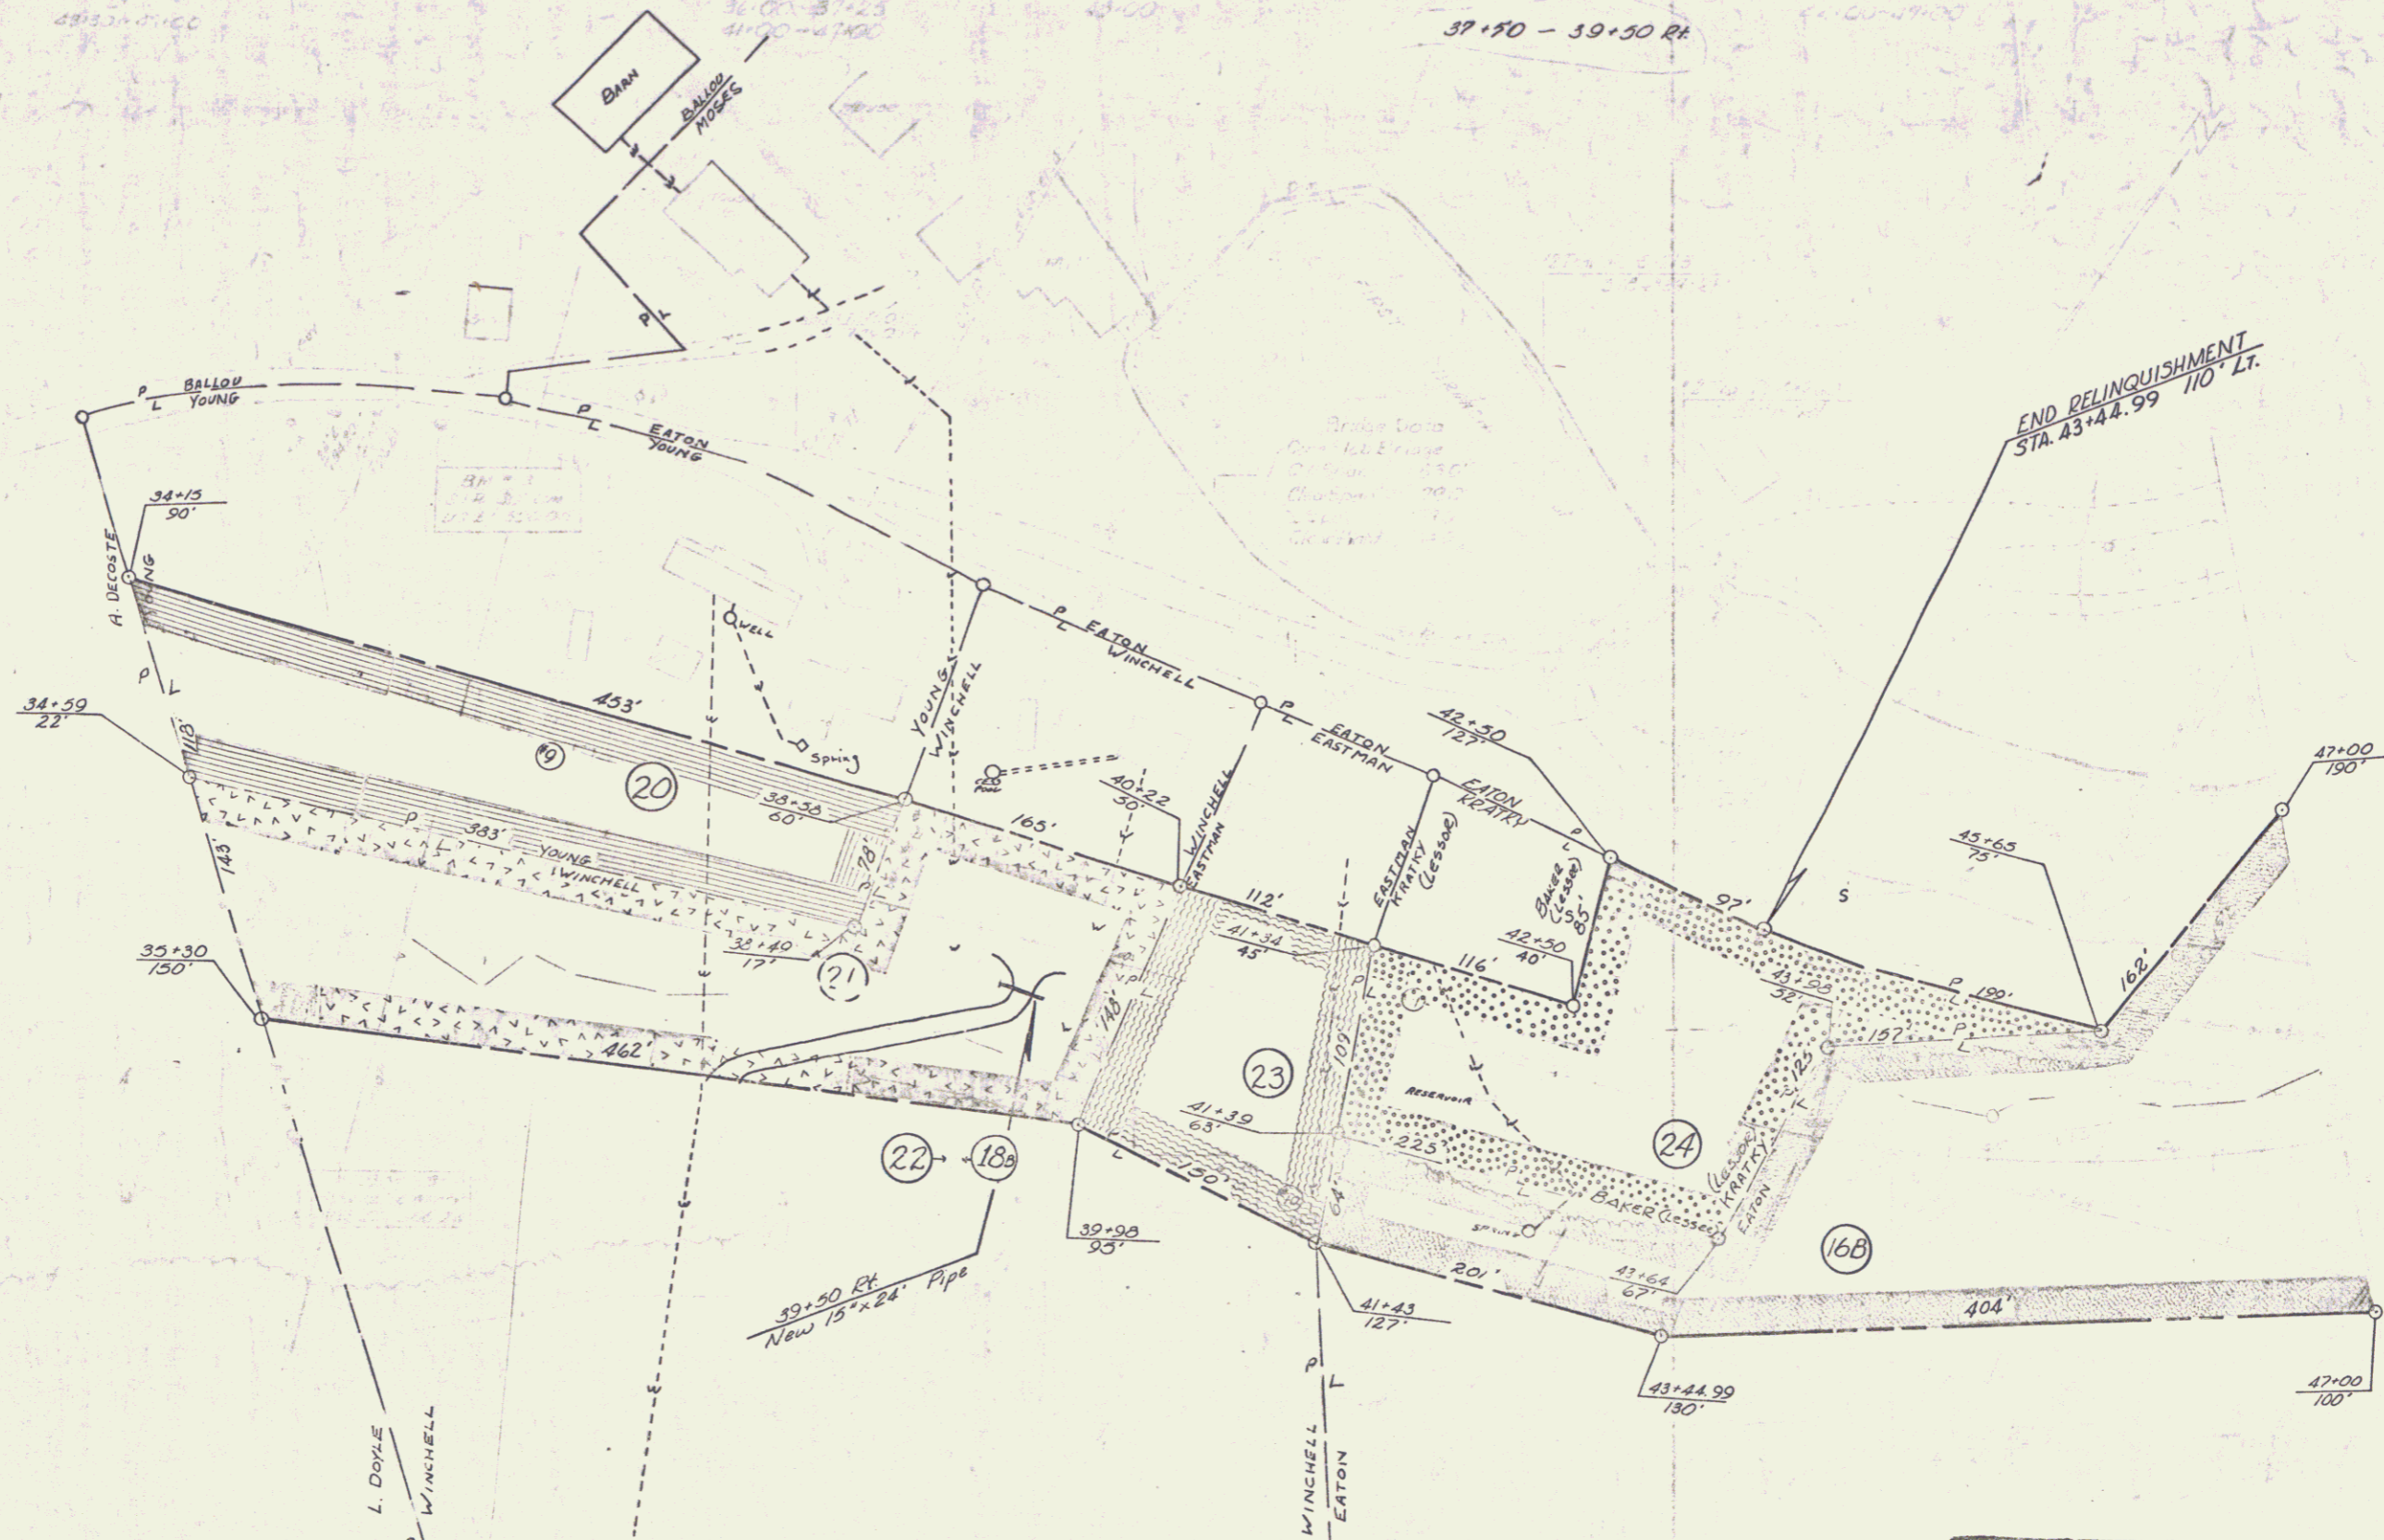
PLAN PROFILE OF ROAD ENLARGED
